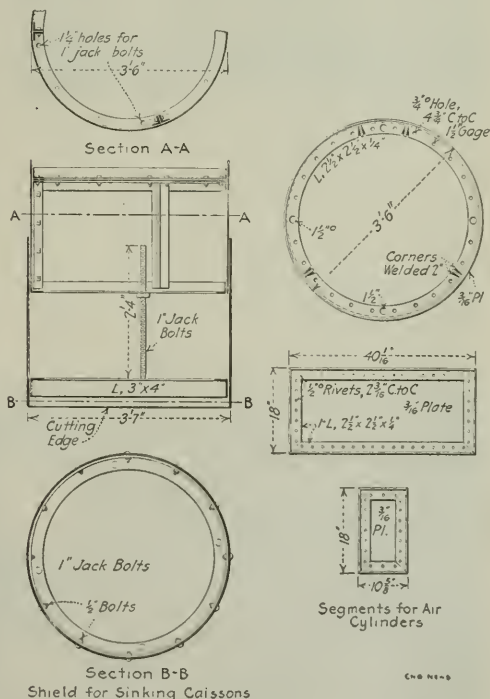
SECTIONAL CAISSONS OF CAST IRON SUNK WITH SHIELD
